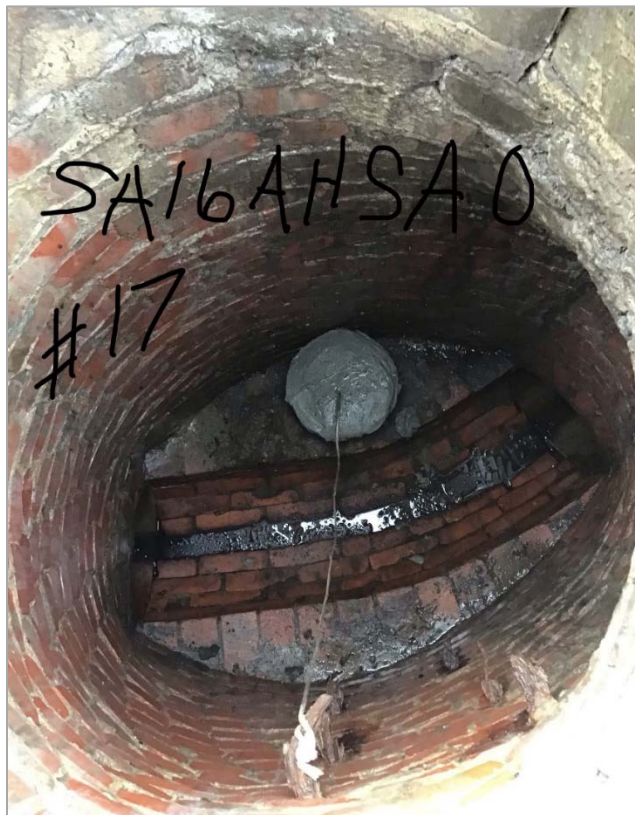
Common Trench Over/Under Piped Access Sewer
